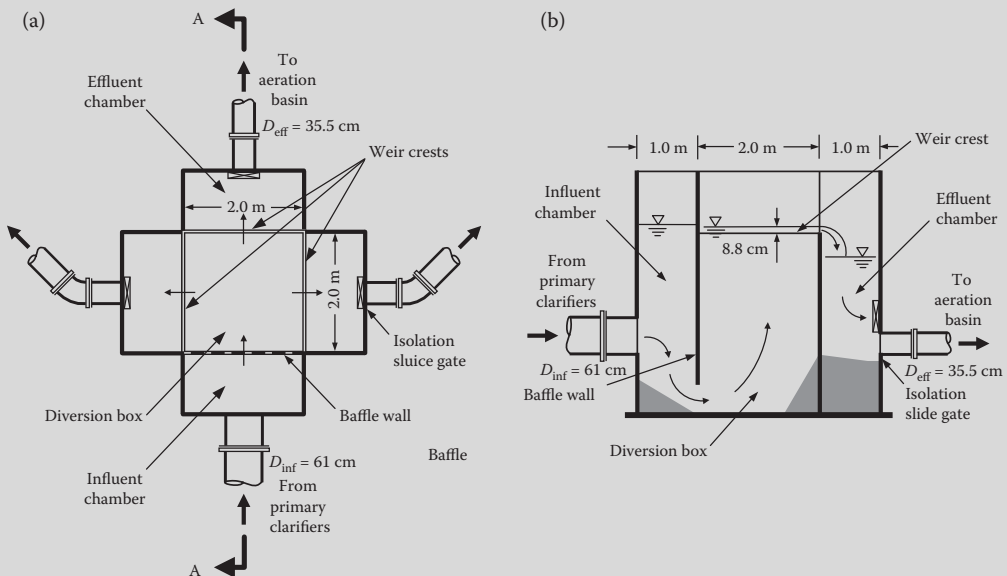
Definition sketch of a diversion structure: (a) plan view, and (b) sectional view (Section AA) (Example 14.3).
